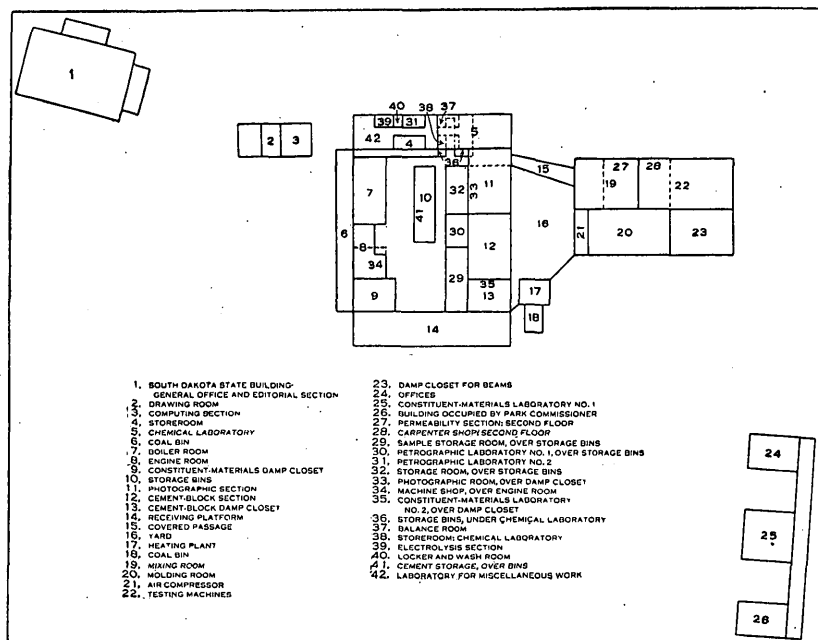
General plan of buildings occupied by structural-materials testing laboratories in Forest Park, St. Louis, Mo.
